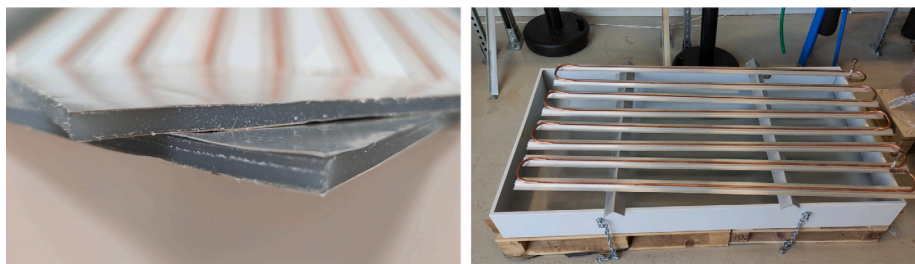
Detail of PCM panel and ceiling box with heat exchanger.
